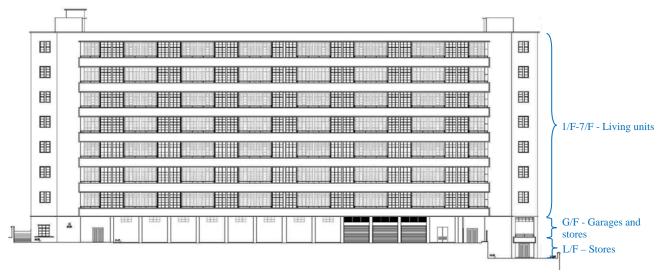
Elevation of Block A of the former Police Married Quarters.
